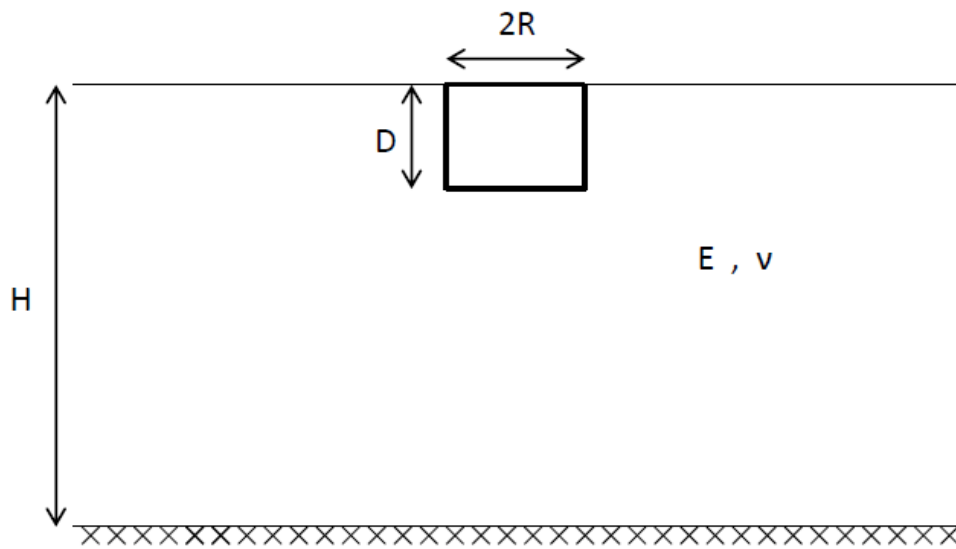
Embedded foundation in a soil stratum resting on bedrock
